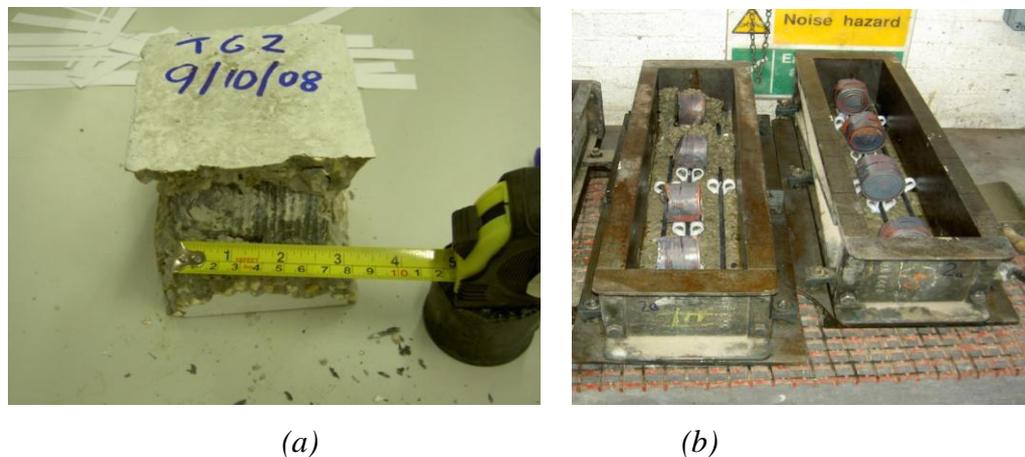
TGCU embedded in precast concrete (a) cube and (b) beams
